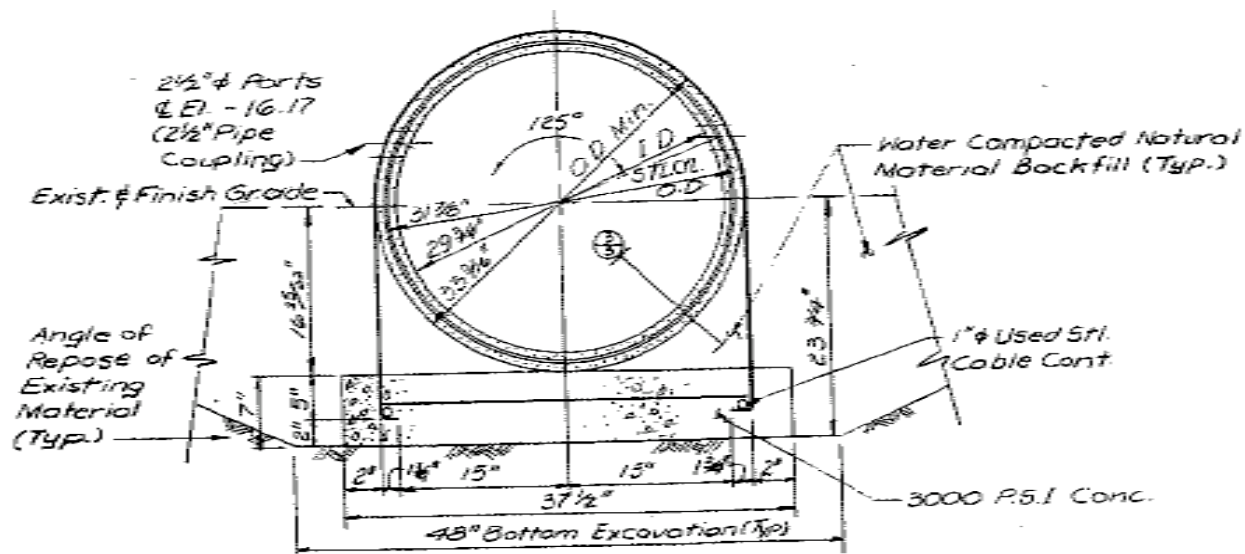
Outfall 001 diffuser cross-section drawing. Source: CDM (1979). "Drawing M-3, Effluent Outfall Diffuser Section Details and Trench Sections".
